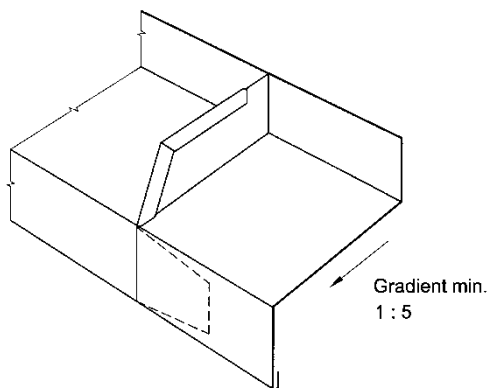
Recommended jointing of windowsill flashing. Jointing must be located between the windows
